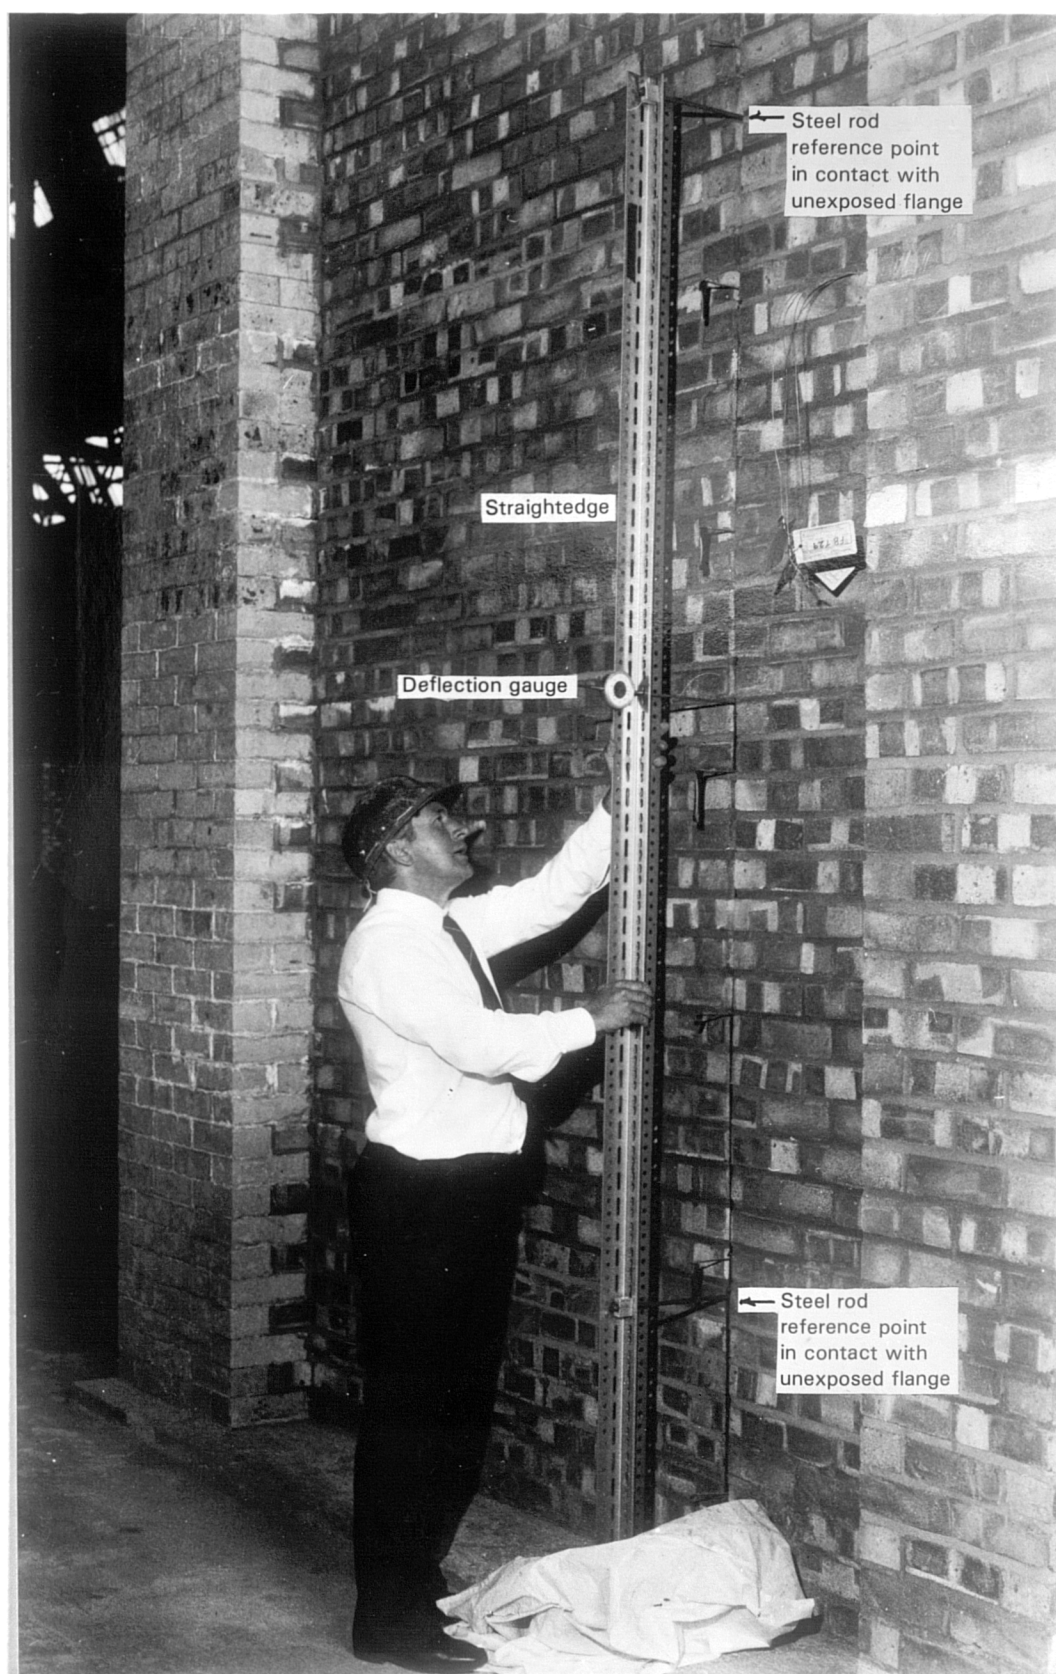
Use of straight-edge for measuring thermal bowing of Cardington column-in-wall
